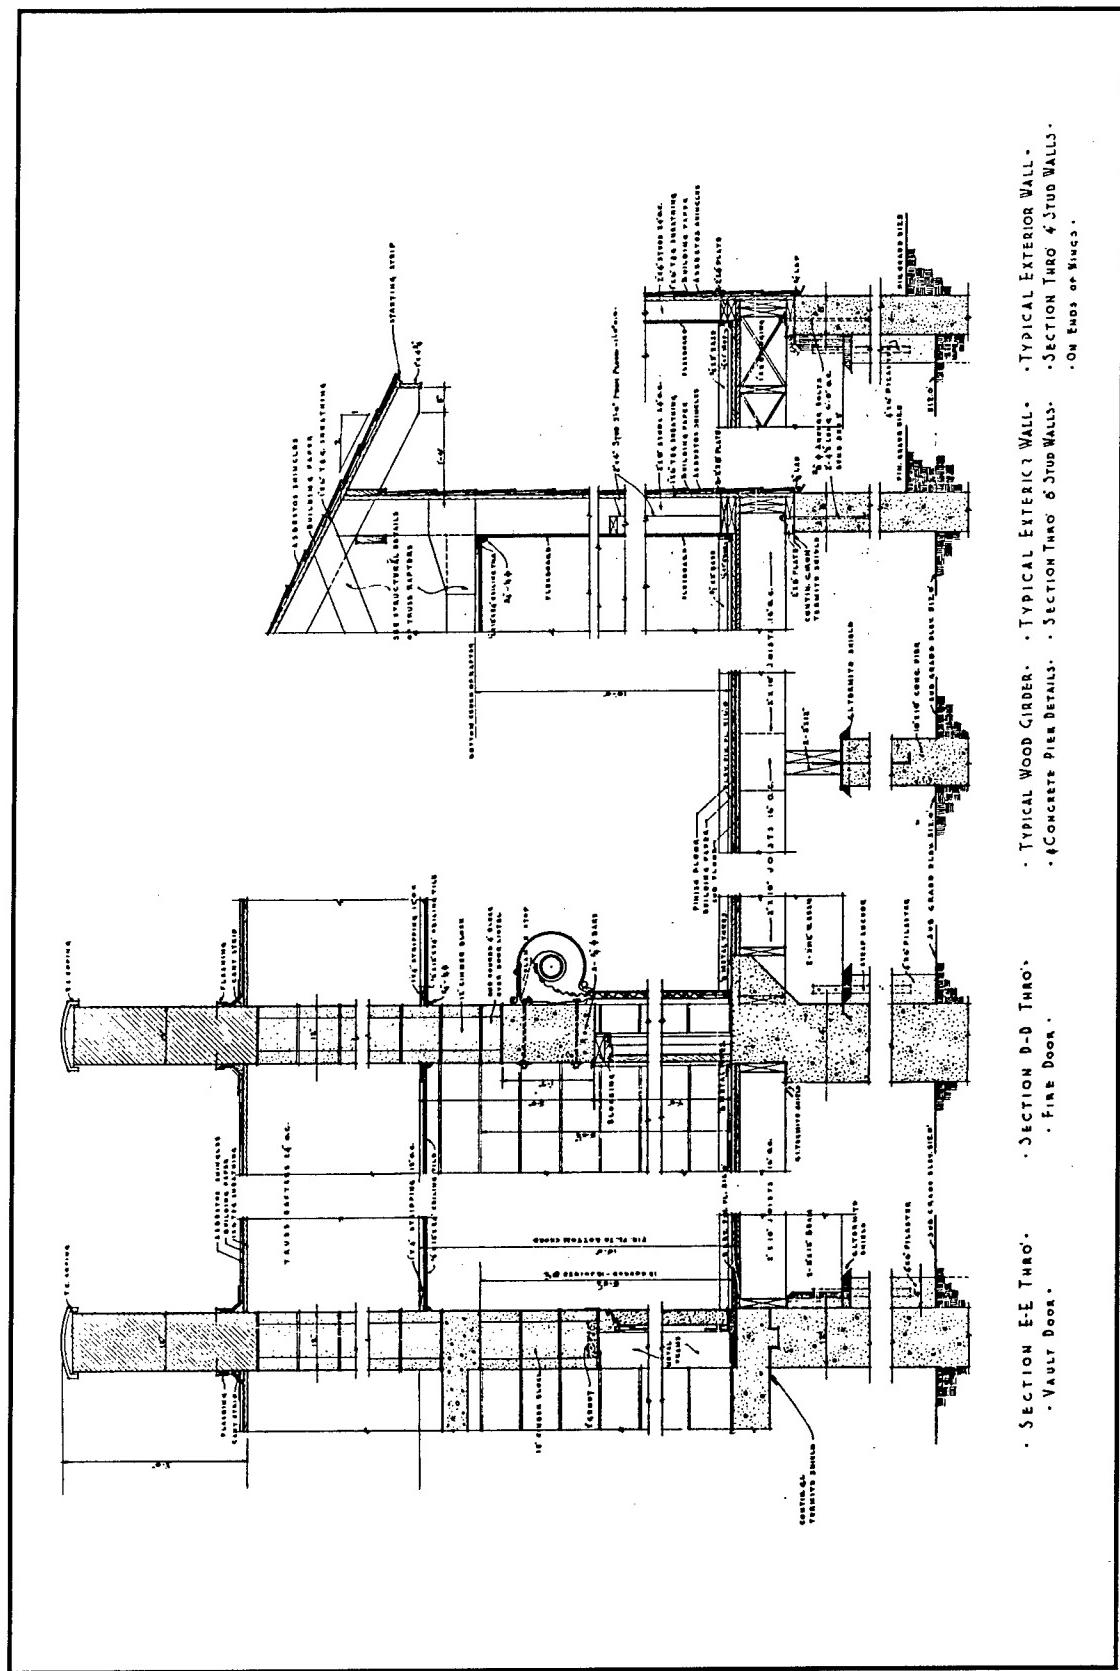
Wall sections and details, Employment Building (Building 2501), Hoosier Ordnance Plant (INAAP Drawing 7020-124).
